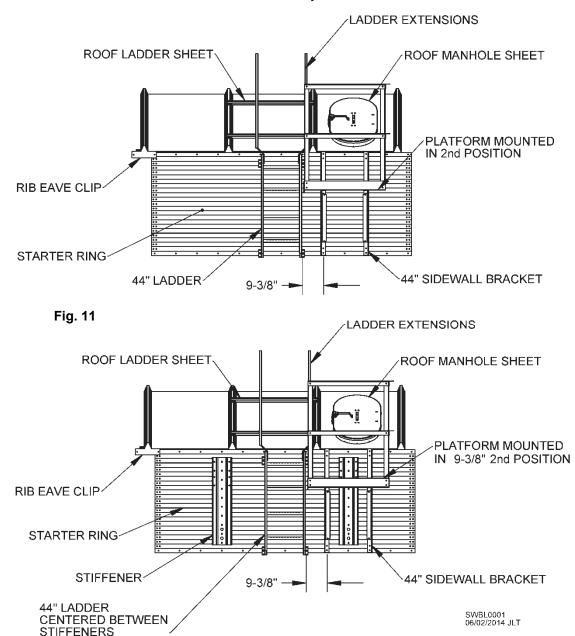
shows the four (4) positions where platform can be located. NOTE: Each location is at same level as a ladder rung in first ring. For 1st & 2nd positions, 44" sidewall bracket mounts to sidewall at horizontal seams and in middle of sidewall sheet. For 3rd & 4th positions, middle hole of 44" sidewall bracket mounts at horizontal seam and top and bottom of bracket are attached in middle of sidewall sheets. Field drilling is required.
